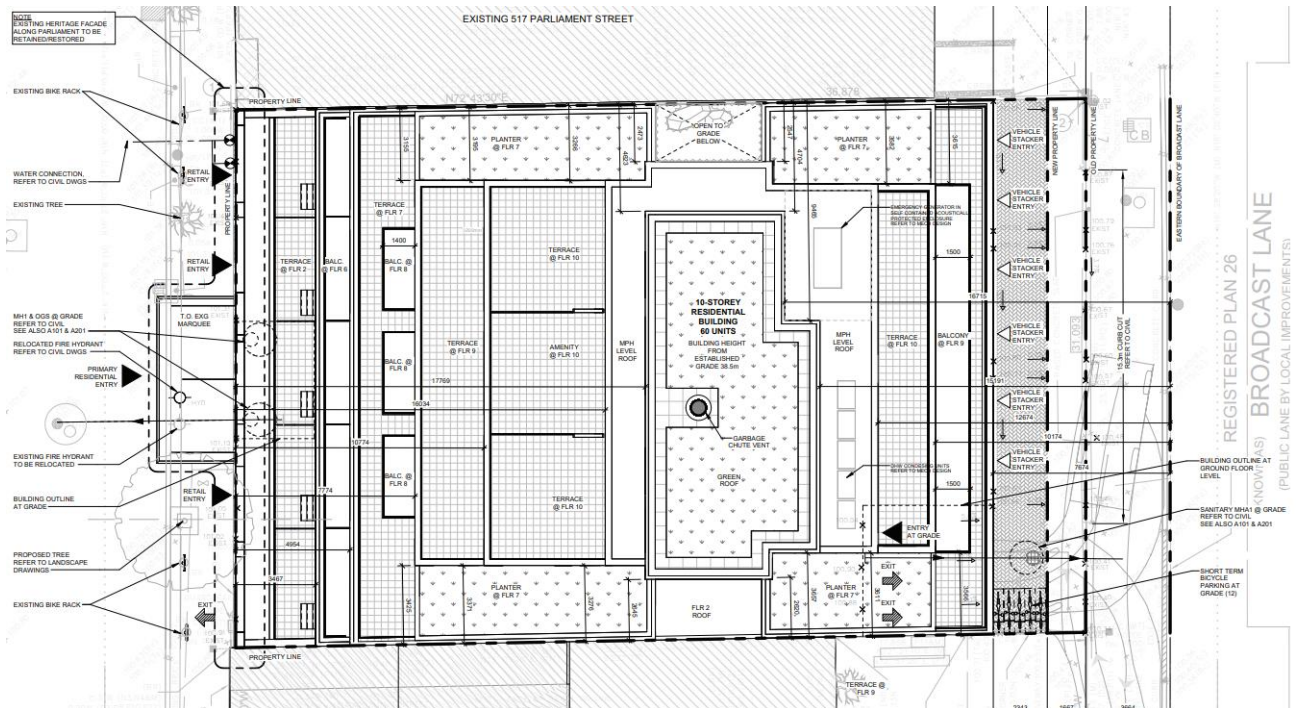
Proposed Site Plan for 509 Parliament Street (RAW Architects Inc., 2025).
